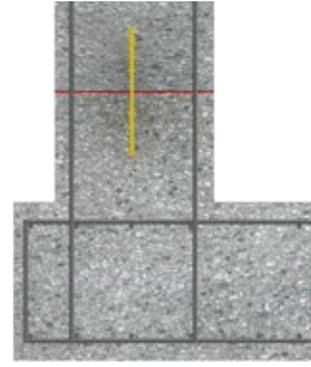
Waterproofing of base slab-wall construction joint with an internal waterbar
